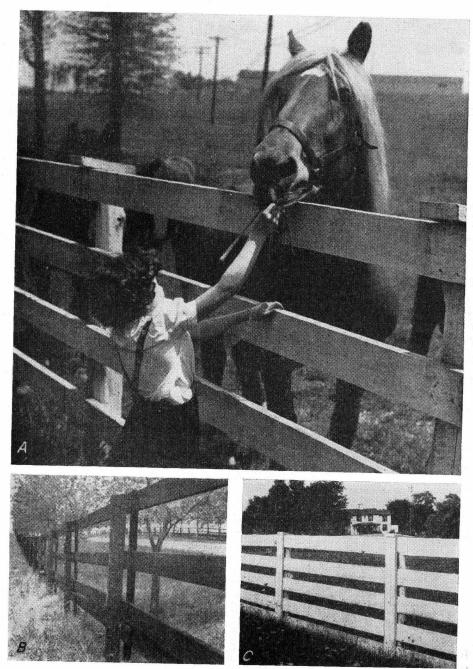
A, A substantial plank fence with joints on alternate posts; B, a board fence and posts treated with creosote—boards are removable; C, a 5-board fence with cleat boards and post caps.
